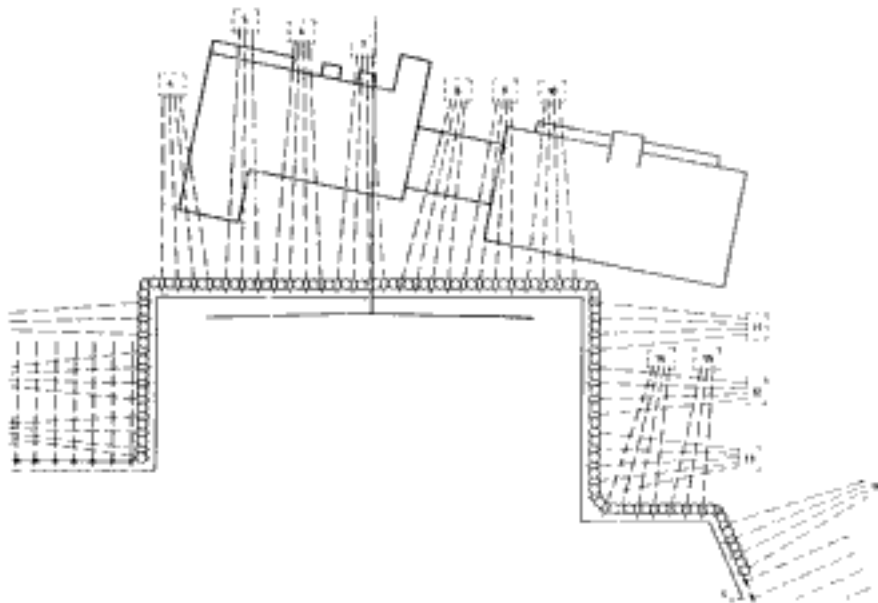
Secant pile wall anchored to deadmen below an existing structure (courtesy of Bauer)
